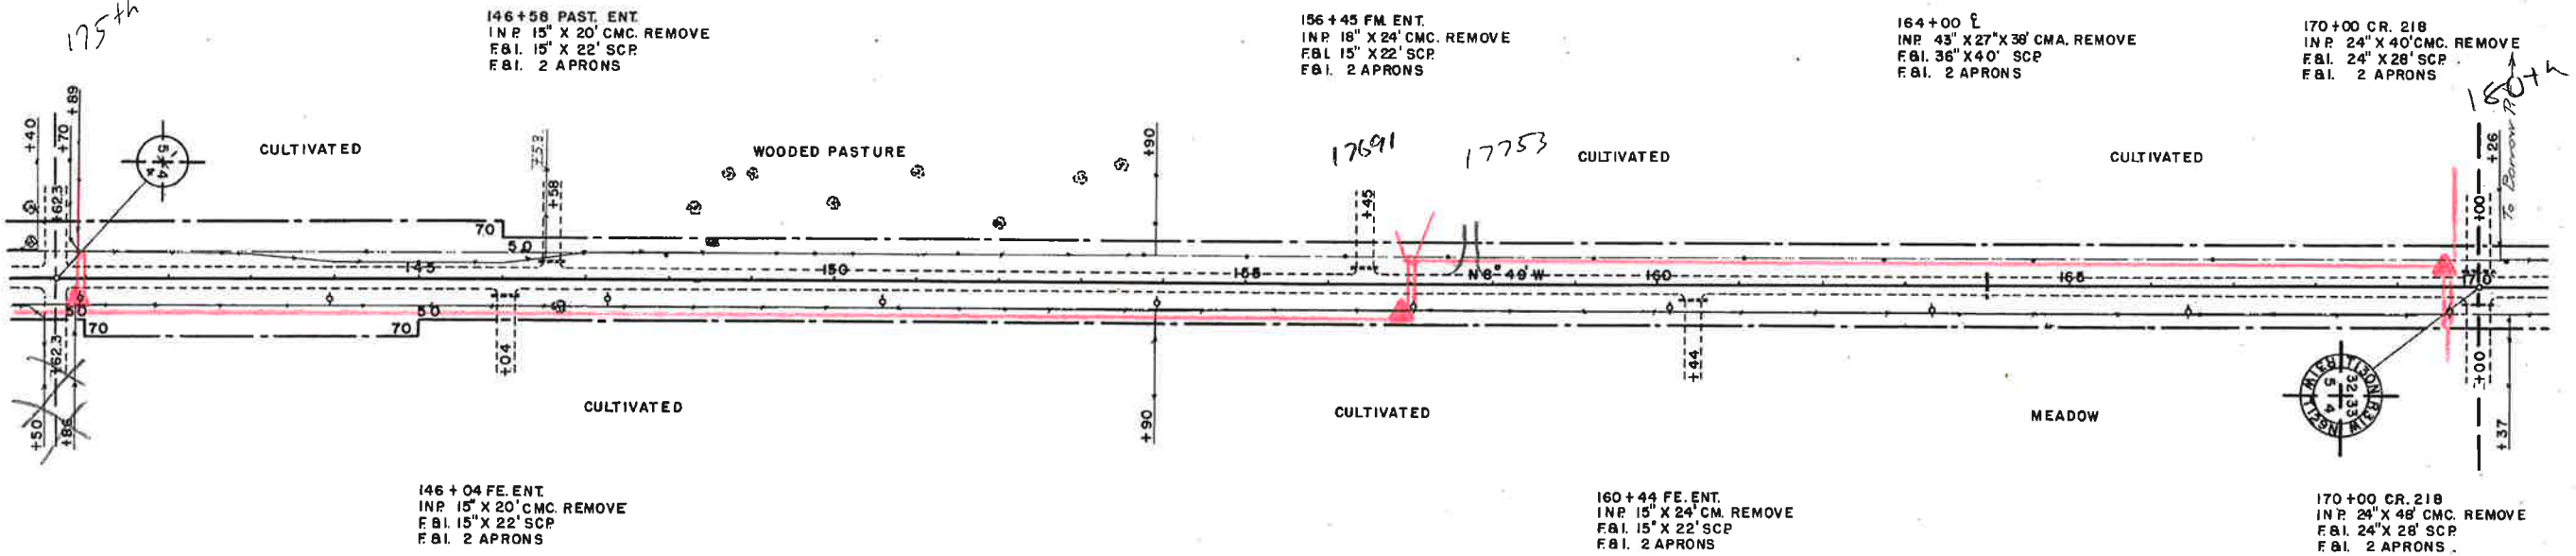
PLAN PROFILE, C.P.P.A. STANDARD
